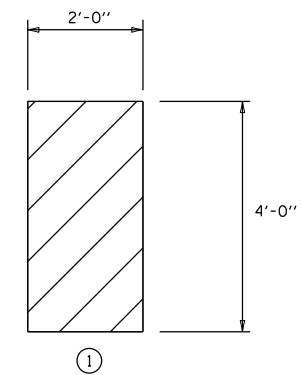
DETAIL OF STRUCTURAL CONCRETE REPAIR AT PIER 2
